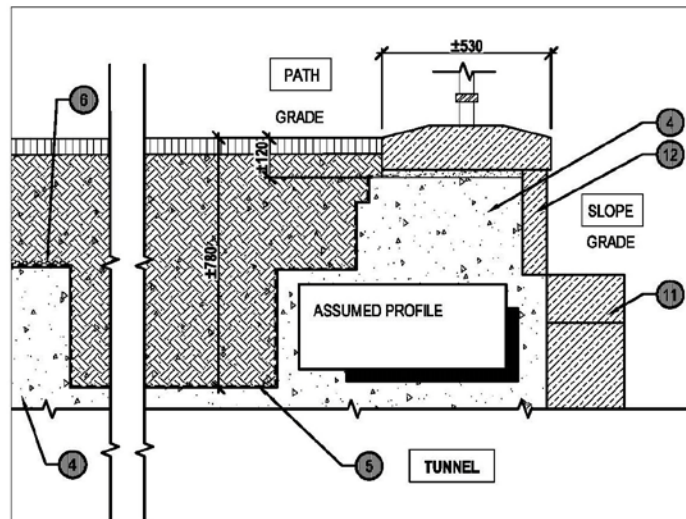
Section at Lookout over Tunnel C3 - existing condition.
